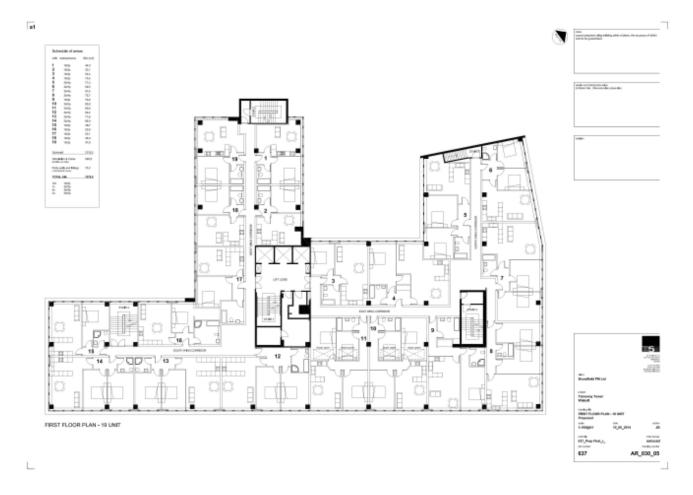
PROPOSED LAYOUT - TYPICAL TOWER FLOOR PLAN
